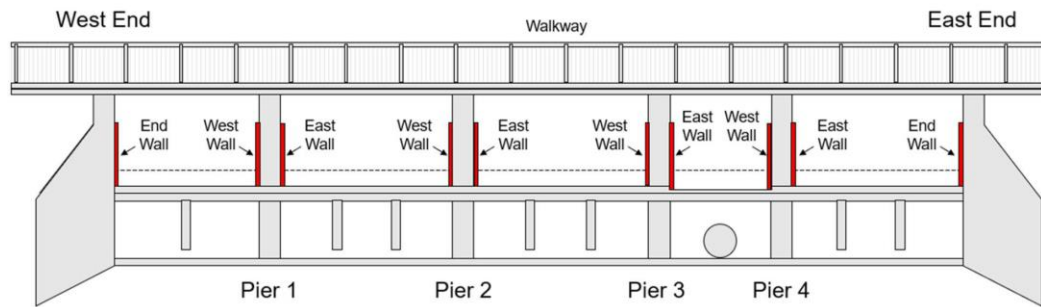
Inspected areas on the bearing piers sides and two embankments
